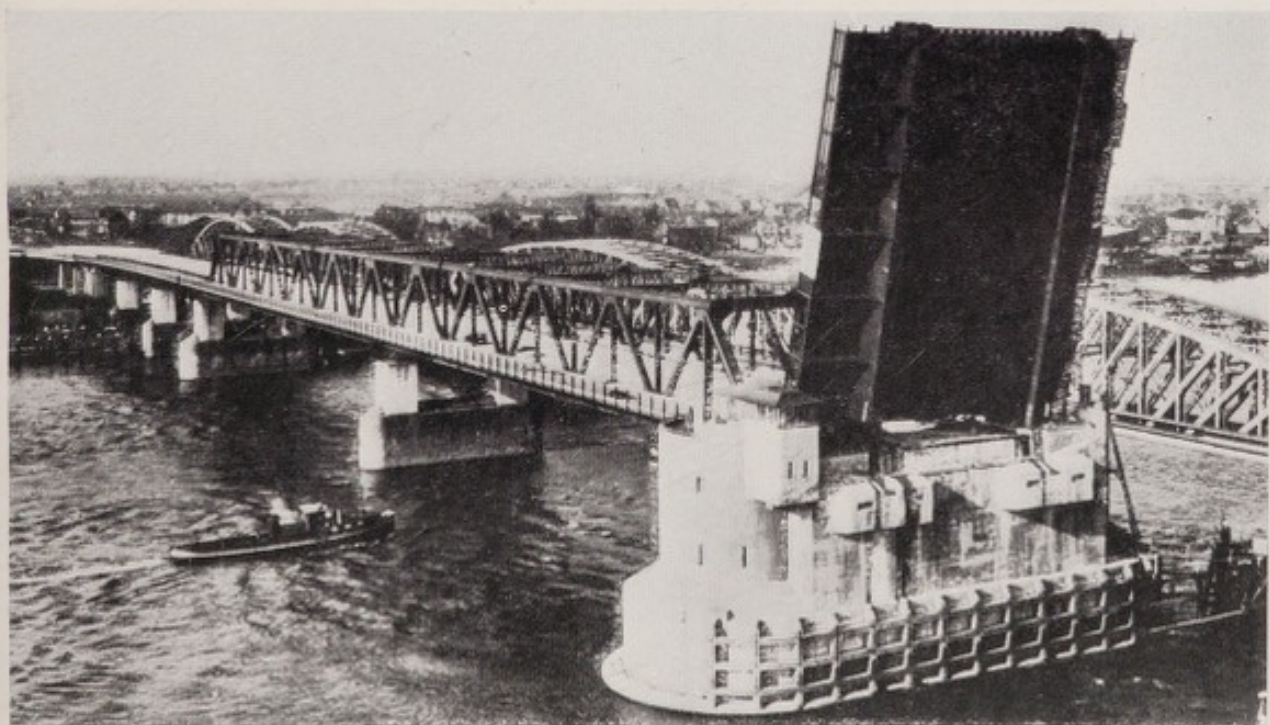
Dordrecht : new road bridge, looking north across the Old Maas
